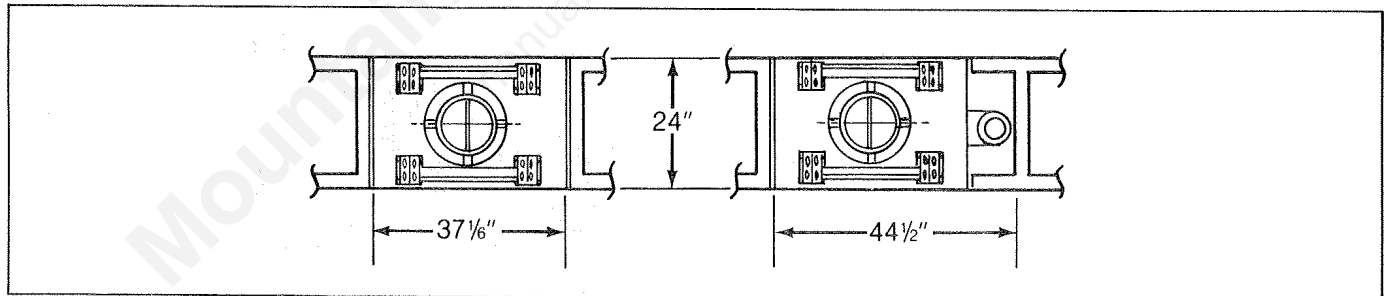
A shows the minimum distance to combustible surfaces for side walls and for walls facing the open front of the fireplace.
